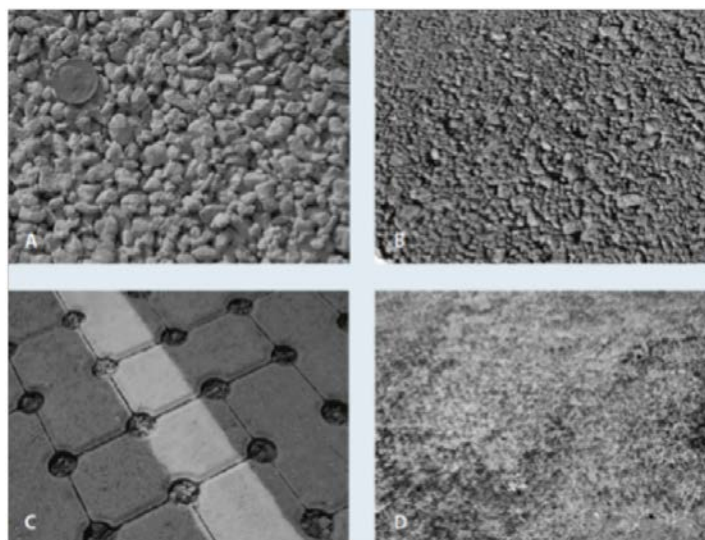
Types of permeable pavements: (A) pervious concrete, (B) pervious asphalt, (C) permeable interlocking concrete pavers (PiCPs), (D) plastic grid reinforced grass pavement (Hunt and Szpir 2006).
